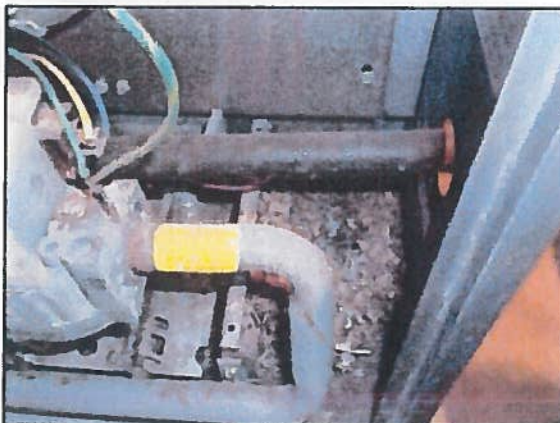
Fire Station 2 – Evidence of rodent nesting in FAU
